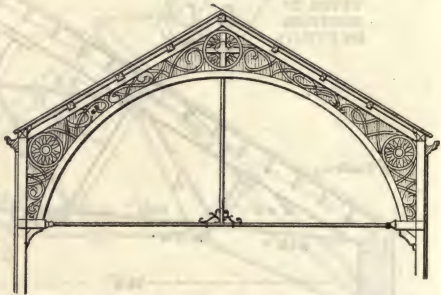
Truss for Metropolitan Concert Hall, New York City
